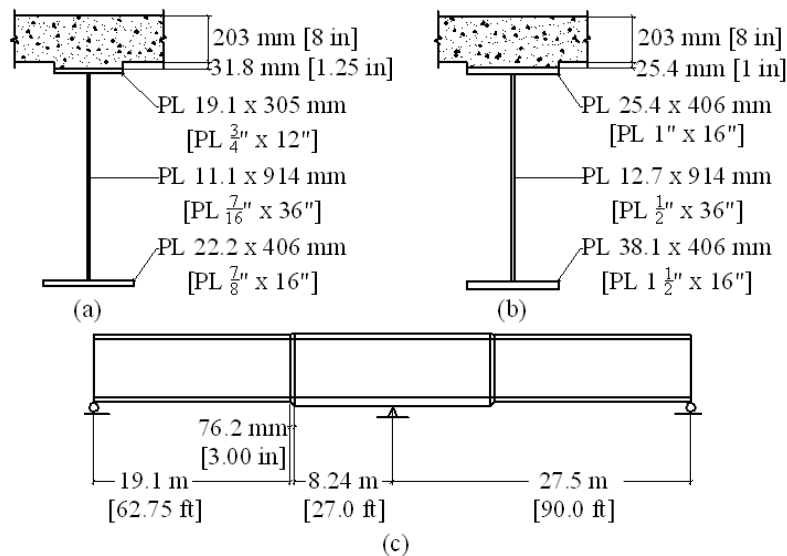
(a) Positive girder cross-section; (b) Negative girder cross-section; (c) Location of positive and negative cross-sections.
